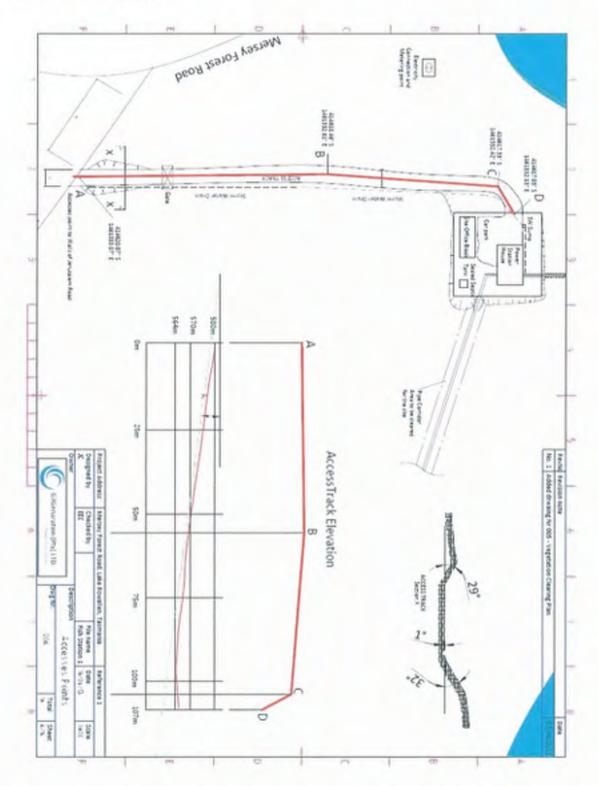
G7 engineers drawings showing designs of access road to power station (note: power station layout has been altered – see figure 9 for final layout design).
